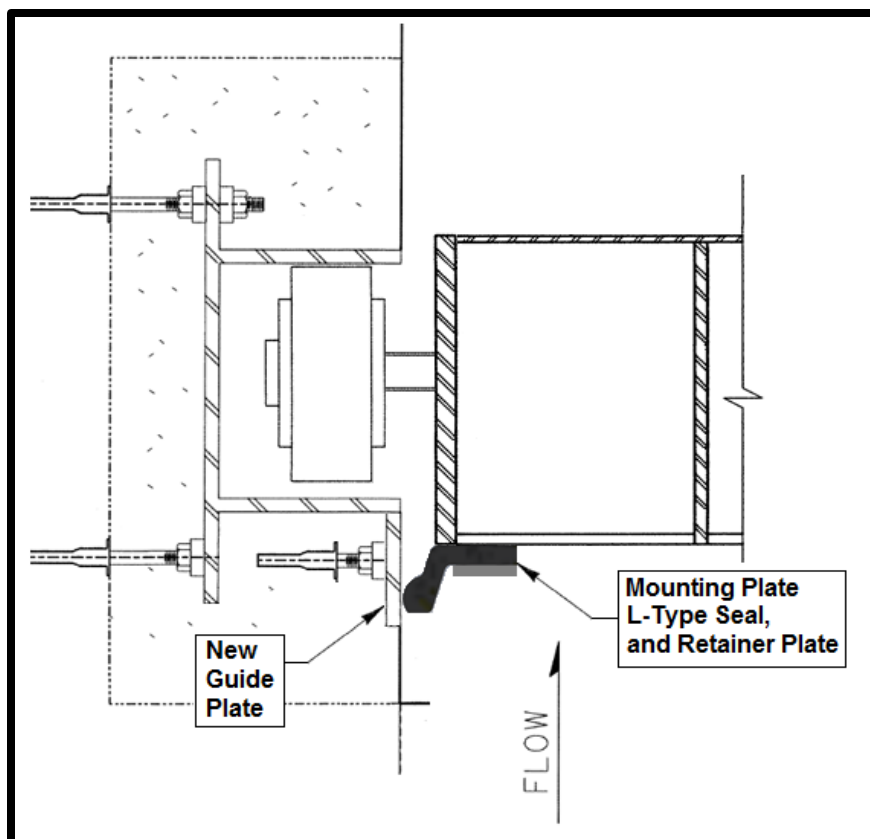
Regulating Outlet Bypass Gate Side Seal Configuration
